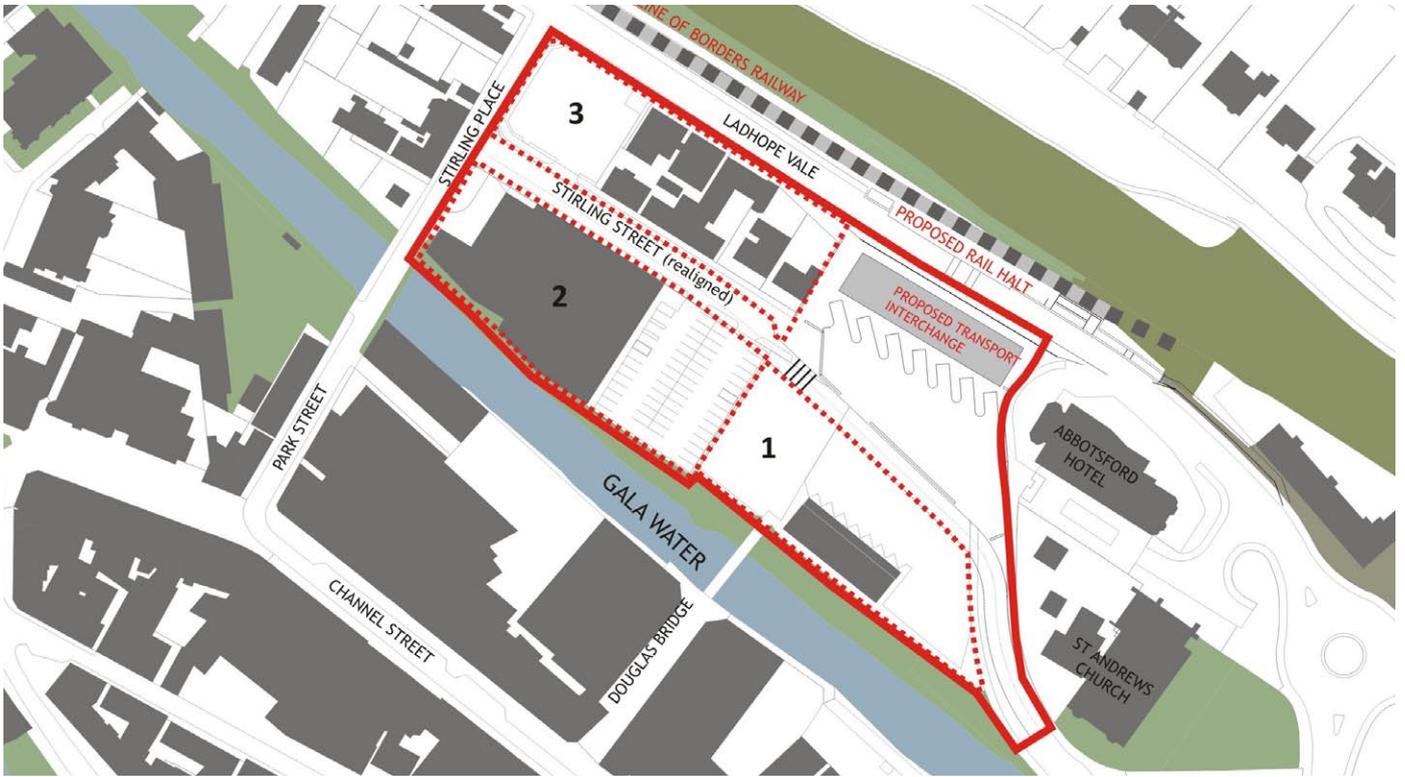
Stirling Street Redevelopment Area, Central Galashiels: Location Plan
